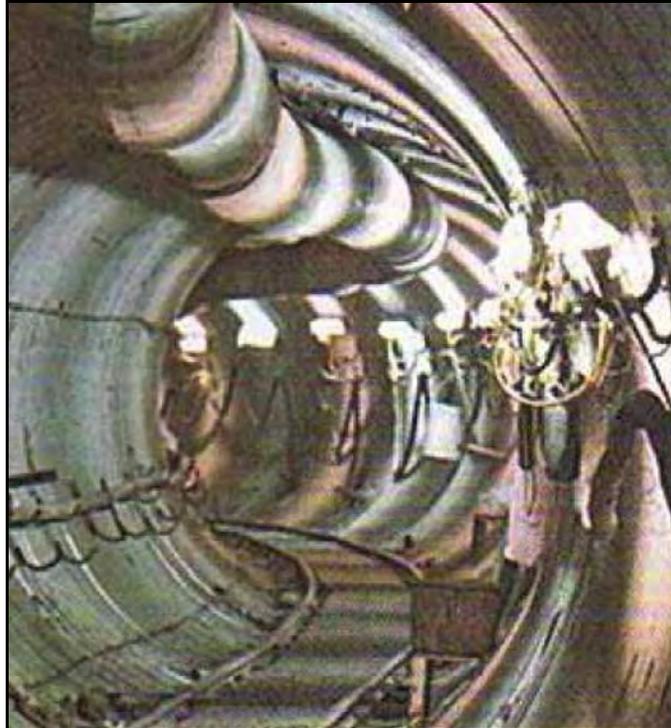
Tunnel Lined with Precast Reinforced Concrete Segments
